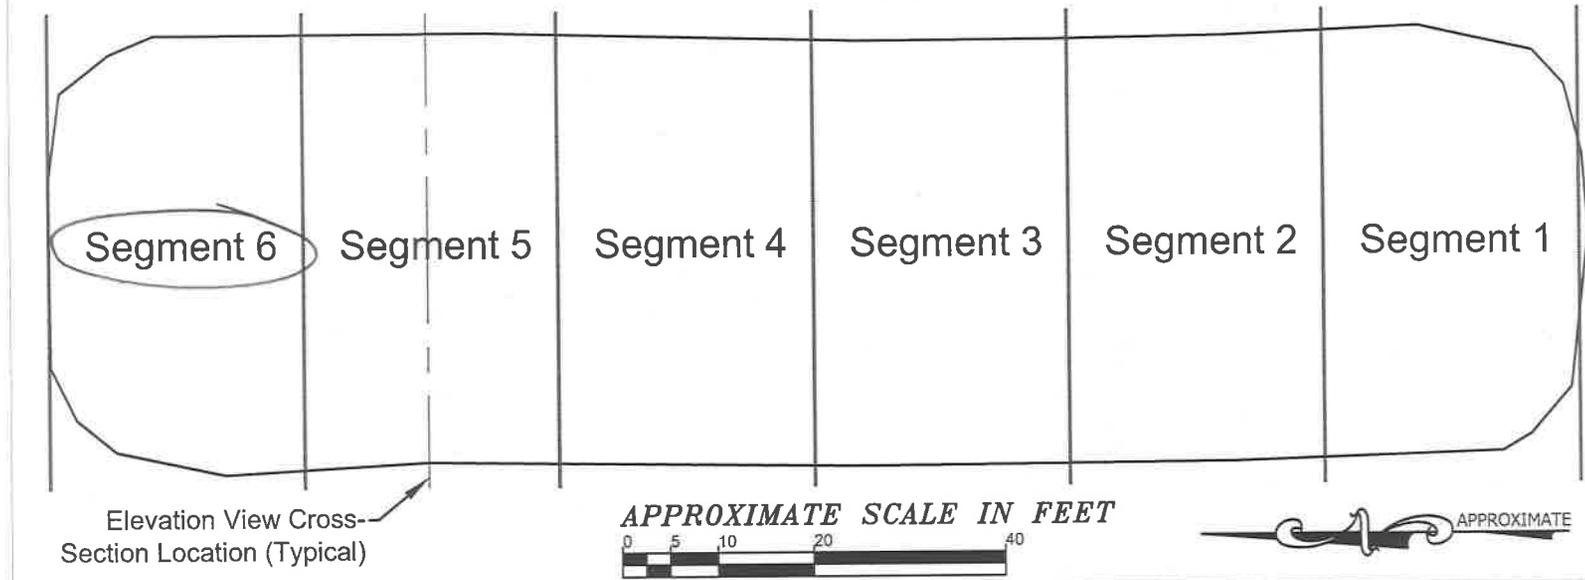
Stockpile A Layout & Proposed Sample Locations
